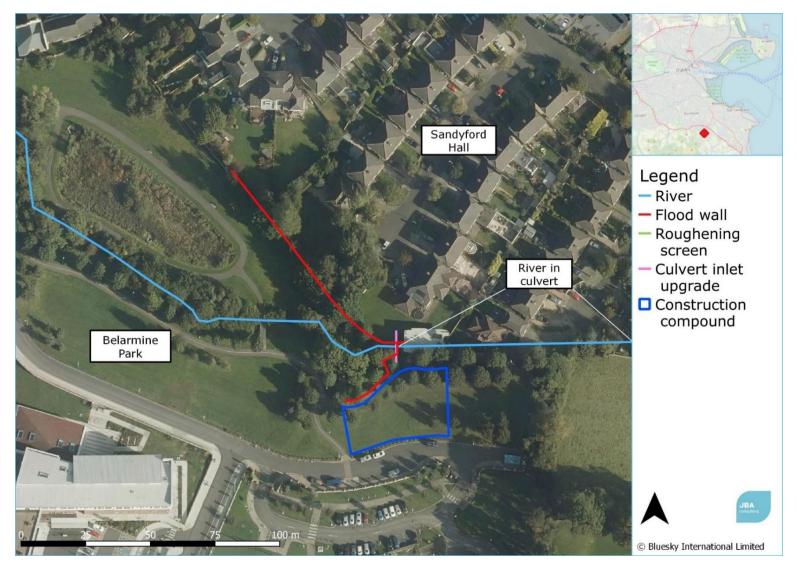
Proposed works at Belarmine Park – 2.B and 2.D
